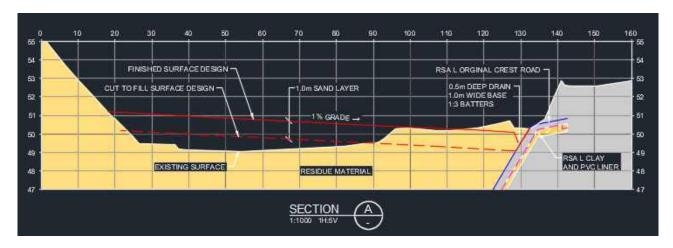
Typical east-west section of the proposed hardstand (from design file provided by Alcoa)
